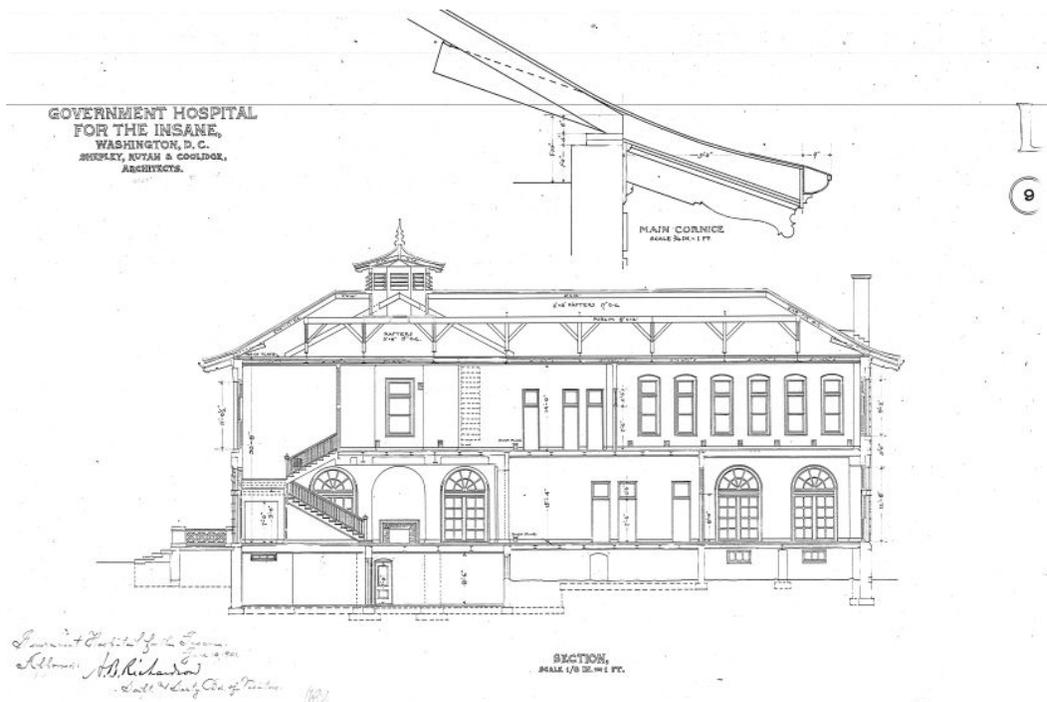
A transverse section of the L Building as depicted in 1901. Source: GSA archives, image DC0107SE0115.
